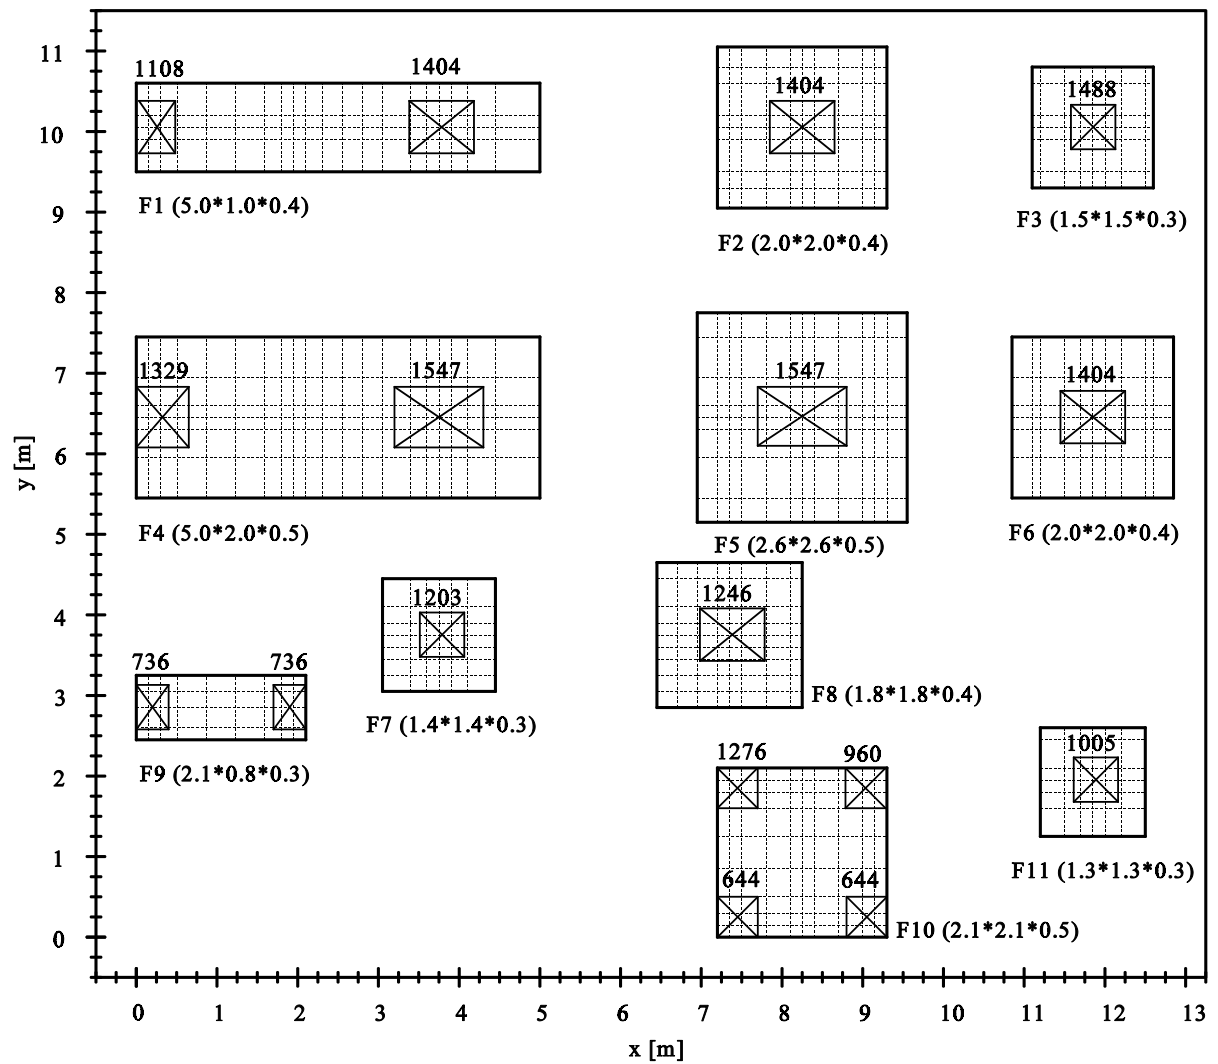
FE-Net of footings without tie beams, loads [kN/m²] and footing dimensions [m]
